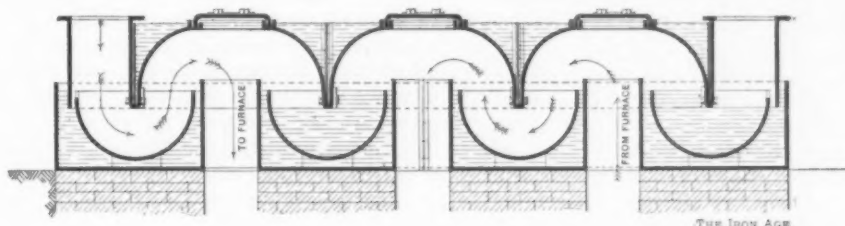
Longitudinal Section.—Cast Iron Construction.
